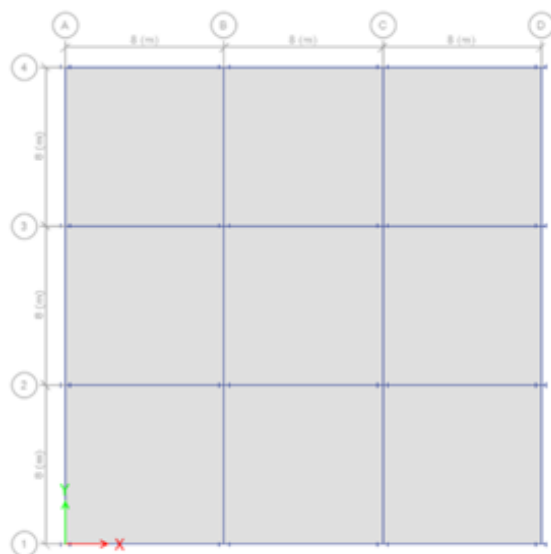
TYPICAL PLAN COMMON TO ALL 22 STOREY DIAGRID BUILDING
